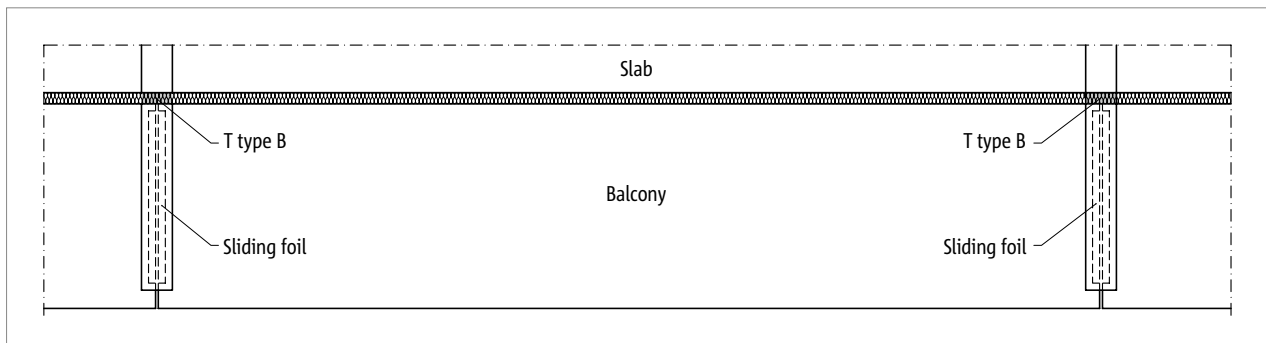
Schöck Isokorb® T type B: Balcony construction with free cantilevered inner slab joists (precast balcony)
